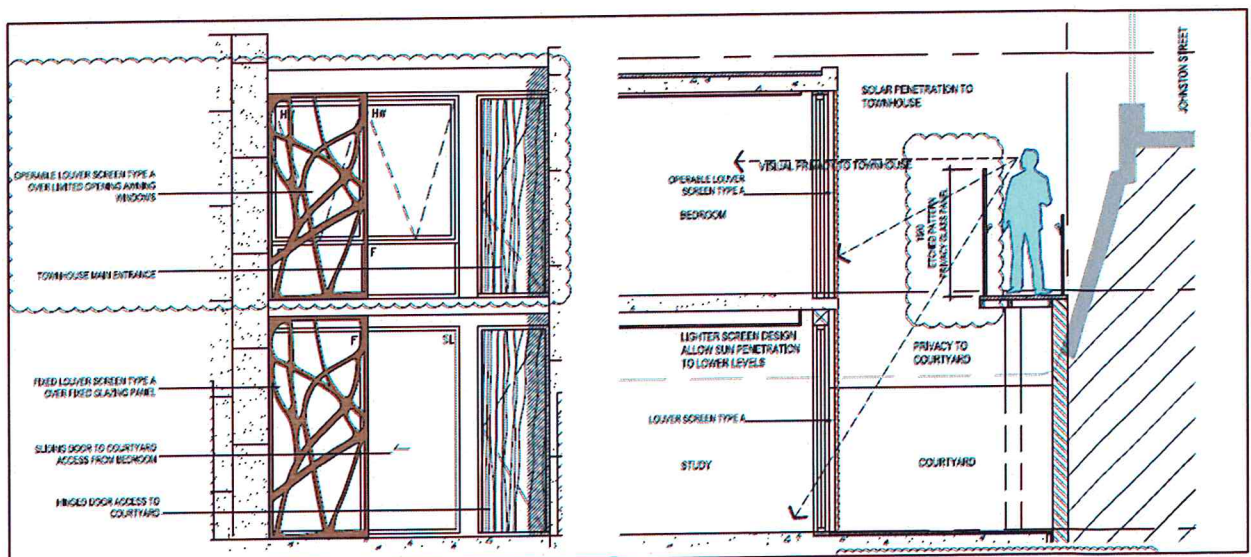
Proposed 1.6m balustrade height of screen to northern edge of elevated pedestrian walkway and detail of laser cut metal operable louvres to south facing windows (source: tony owen partners drawing 680 Rev D, dated 21.04.2015).
